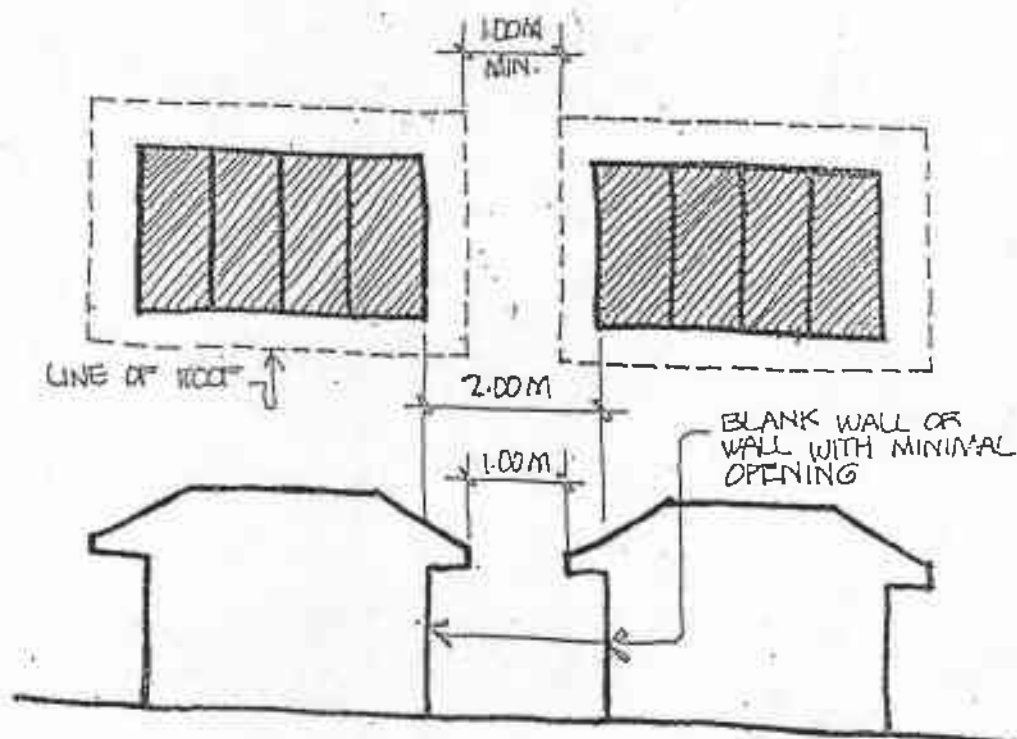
DISTANCE BETWEEN BLANK WALLS OF TWO BUILDINGS
